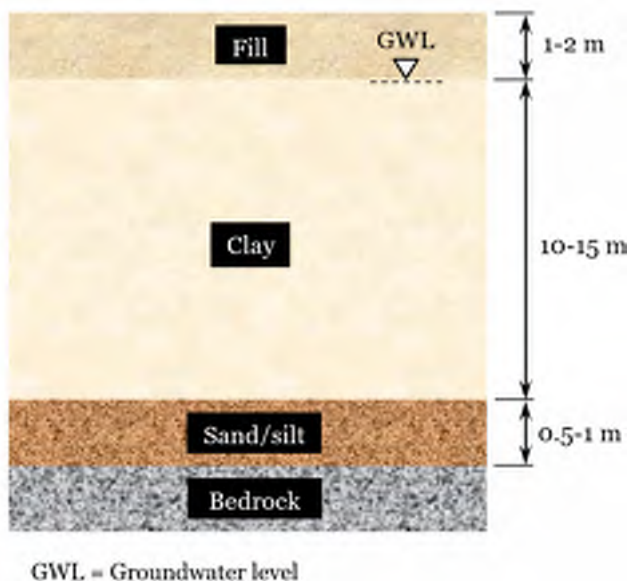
Typical geotechnical conditions at the site of SL10 (schematic presentation).
